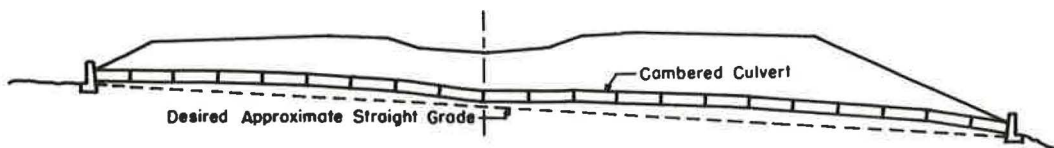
Typical cambered flow line for culvert beneath 4-lane divided highway.
